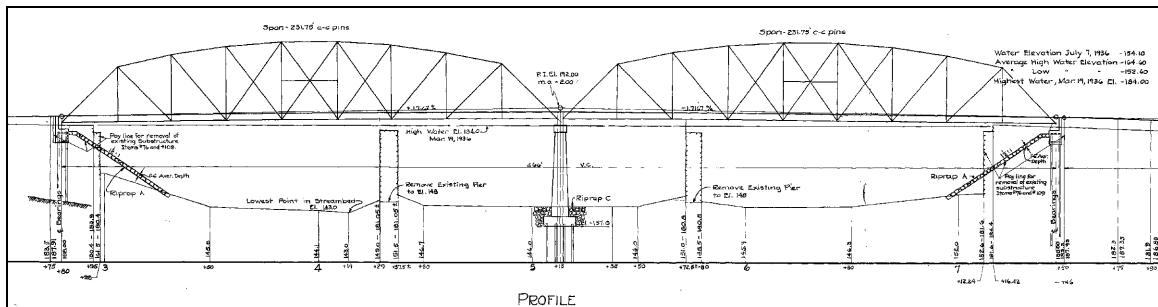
Elevation drawing from original bridge plans (NHDOT 1935).
